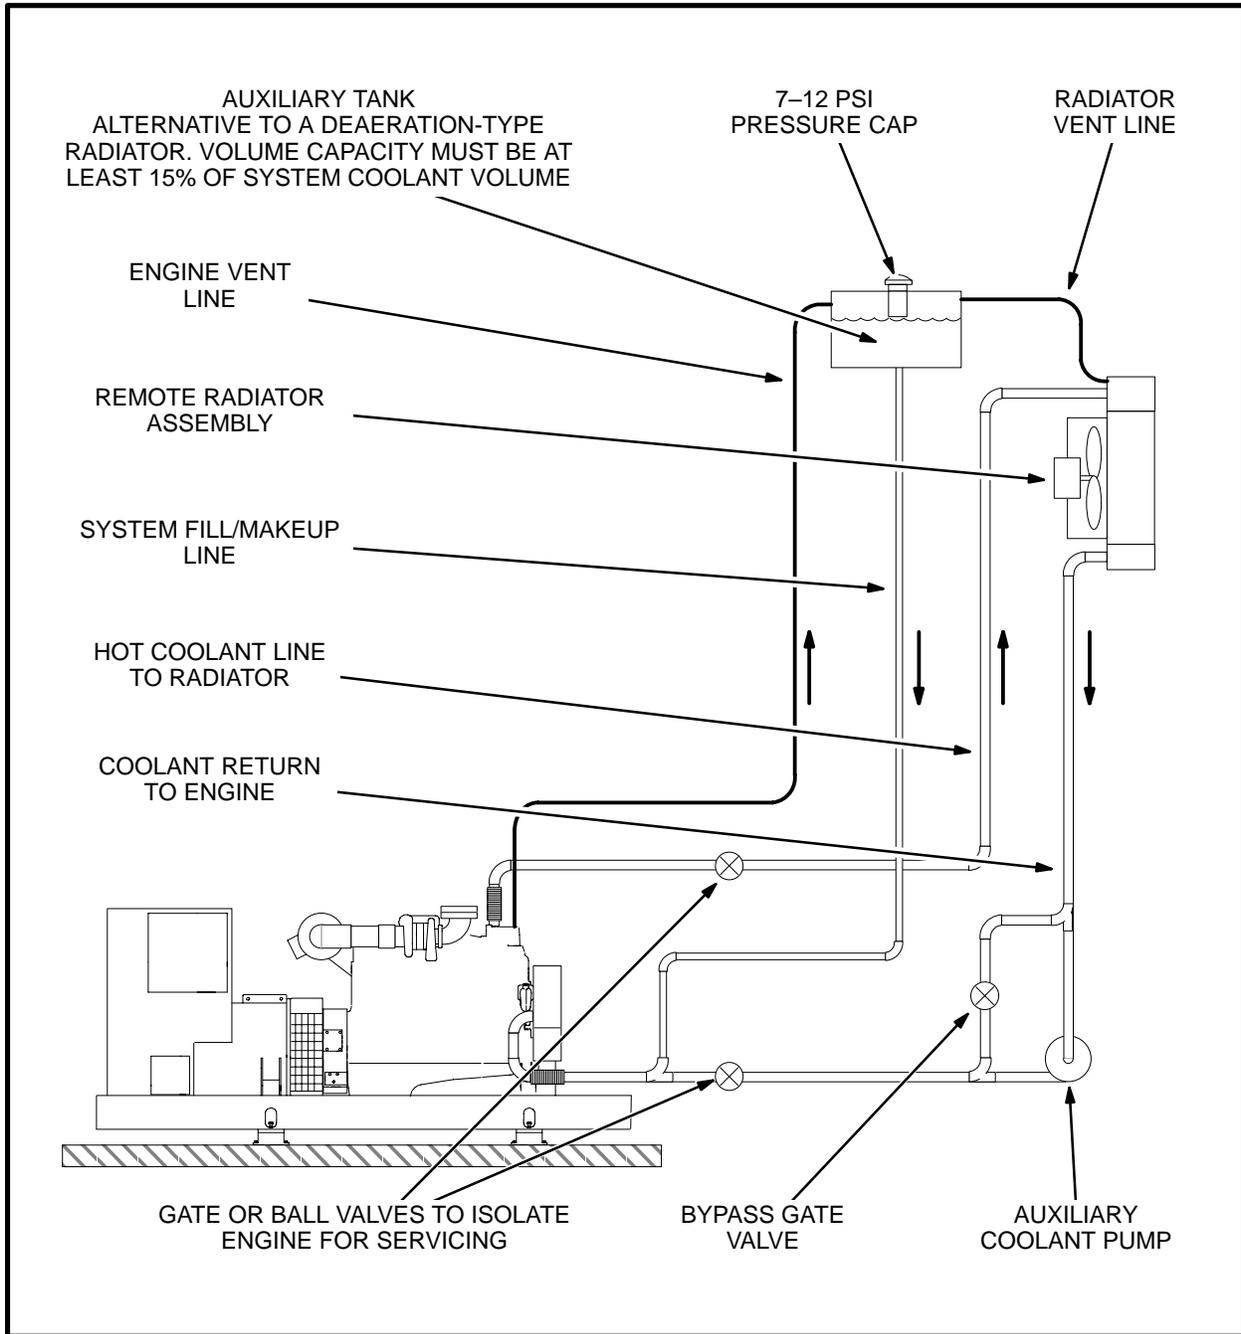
Remote Radiator With Auxiliary Coolant Pump and Auxiliary Tank
